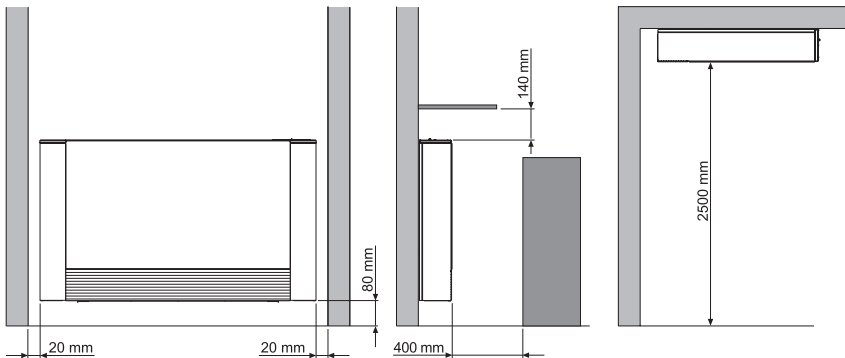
shows the minimum installation distances of the fan coil unit from walls and furniture in the room.
